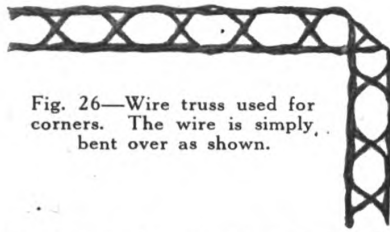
Wire truss used for corners. The wire is simply bent over as shown.
